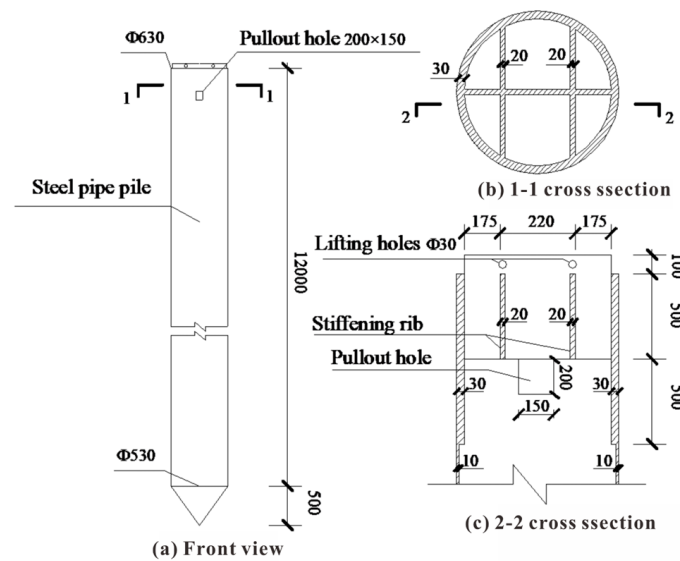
Recoverable steel-pipe pile structure. (a) Front view; (b) 1–1 cross section; (c) 2–2 cross section.
